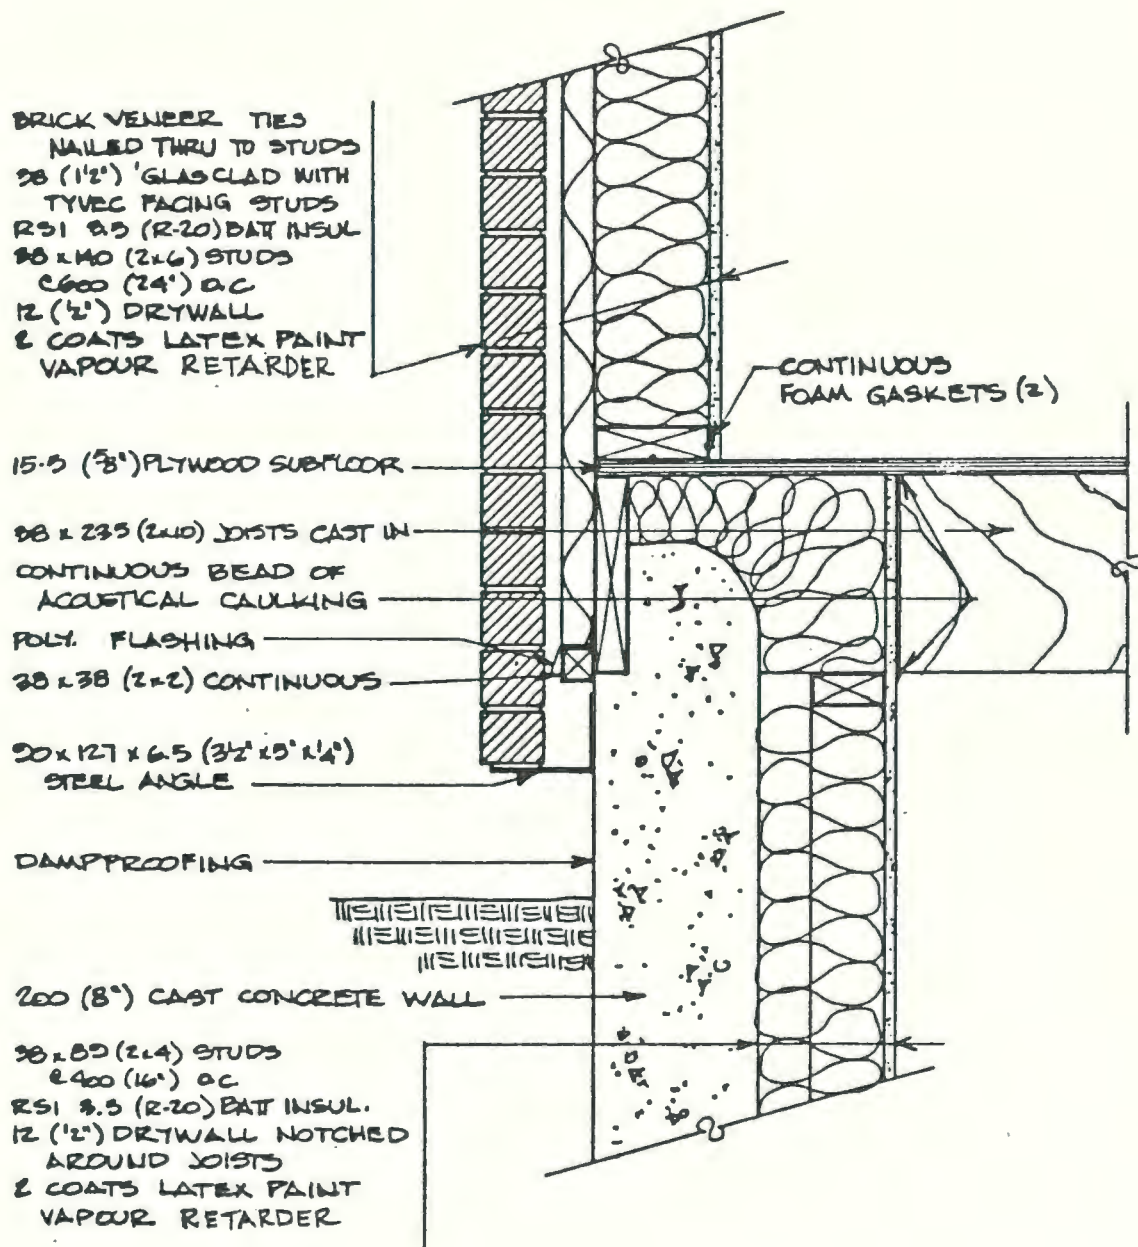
Top of Concrete Foundation Wall with Brick Cladding - Alberta Demonstration House
